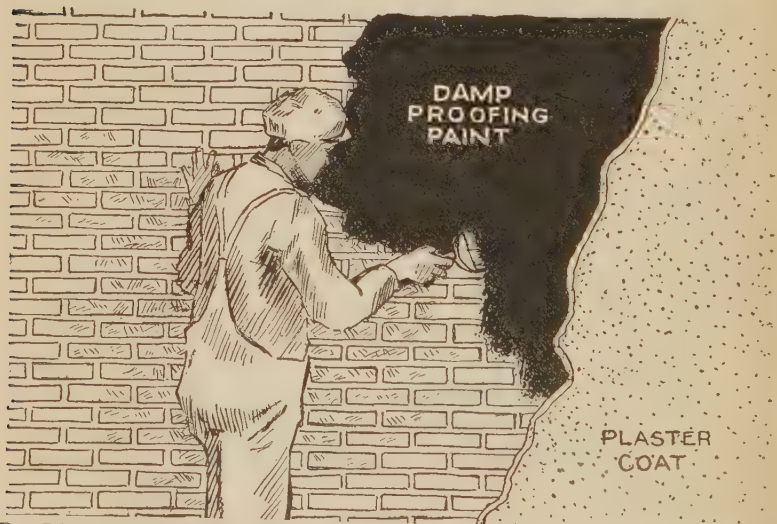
,275.—Damp proofing point and plaster coat. The illustration shows the application of a heavy, penetrating, tacky, bonding and damp-proofing paint to a brick wall. The plaster coat is troweled directly on the painted surface, thus protecting the paint and preventing flaking and peeling.
